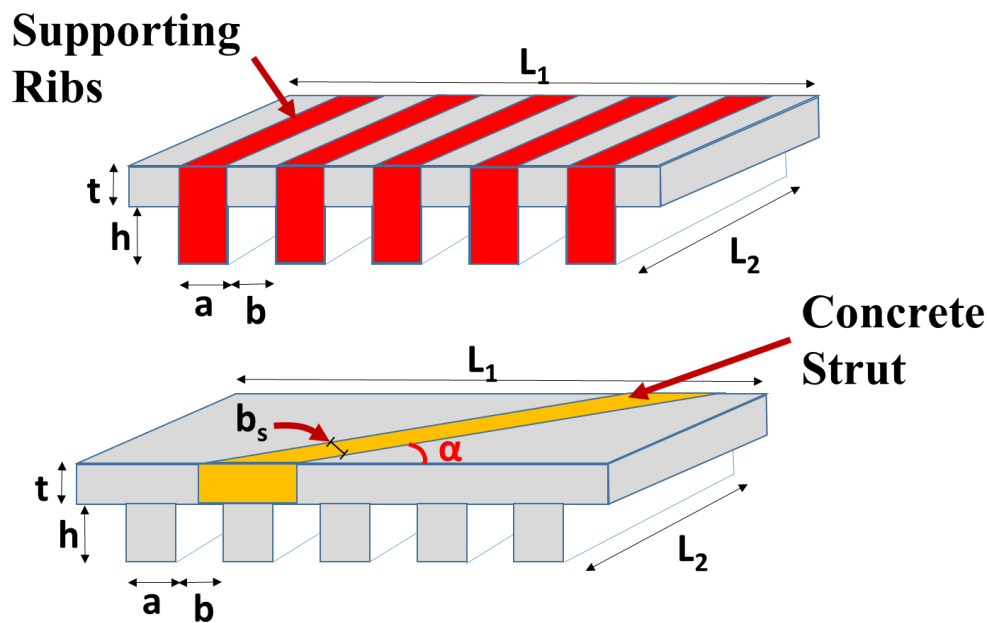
Concrete strut in the topping and the ribs acting as lateral supports
